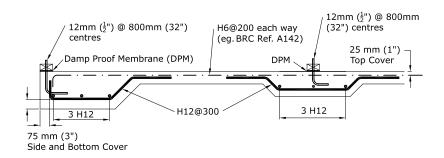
LAYOUT OF SLAB ON GROUND FOOTING
